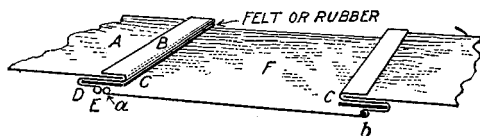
Horizontal Section Through Hinged Clean-Out Door on Rubber or Felting
